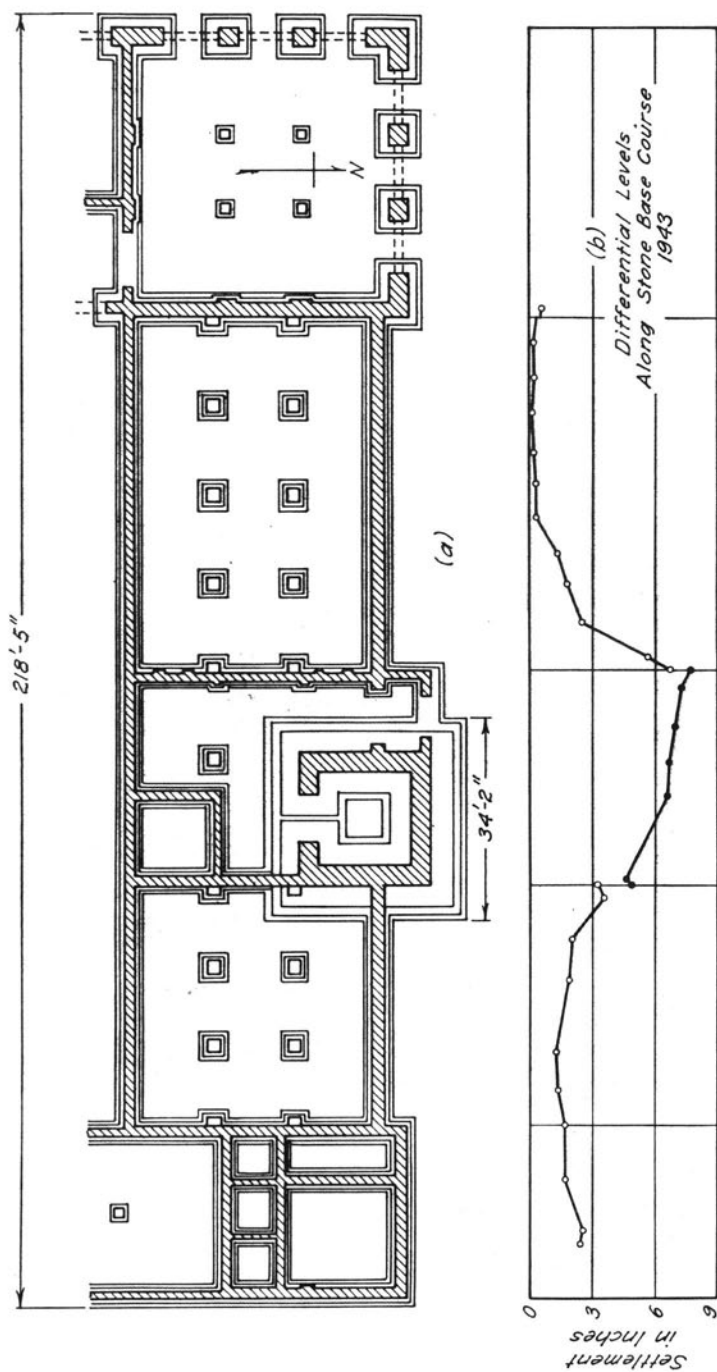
FOUNDATION PLAN OF FRONT PORTION OF POLK STREET STATION, WITH DIFFERENTIAL LEVELS ALONG STONE BASE COURSE OF NORTH WALL (1943)
